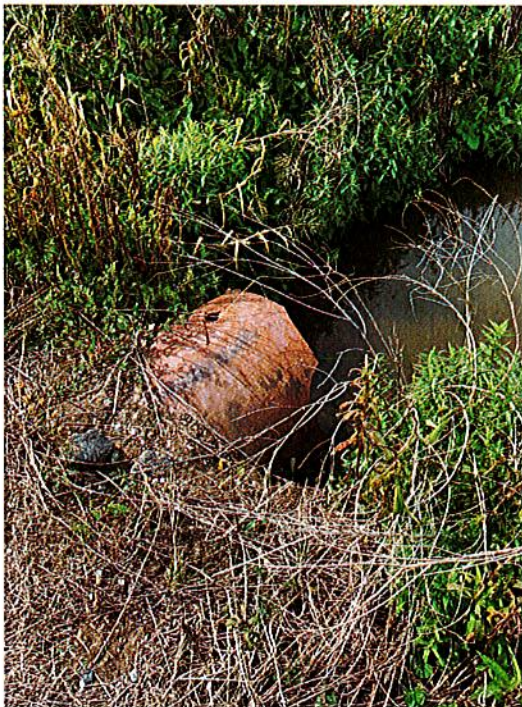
Facing SW at Stream 2 culvert at southwest corner of Site.
